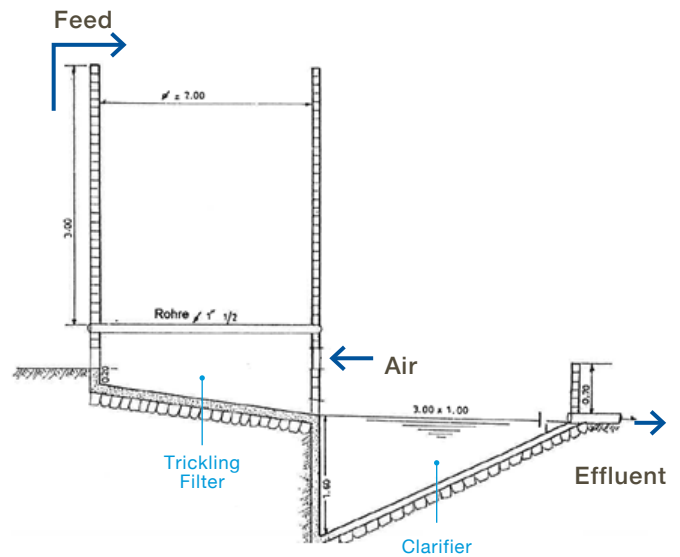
Plan and views of the drip body with secondary clarifier tested in Morocco.^[32]
